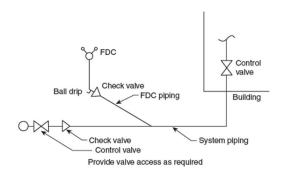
(a) Fire Department Connection to Underground Piping for a Single System.
